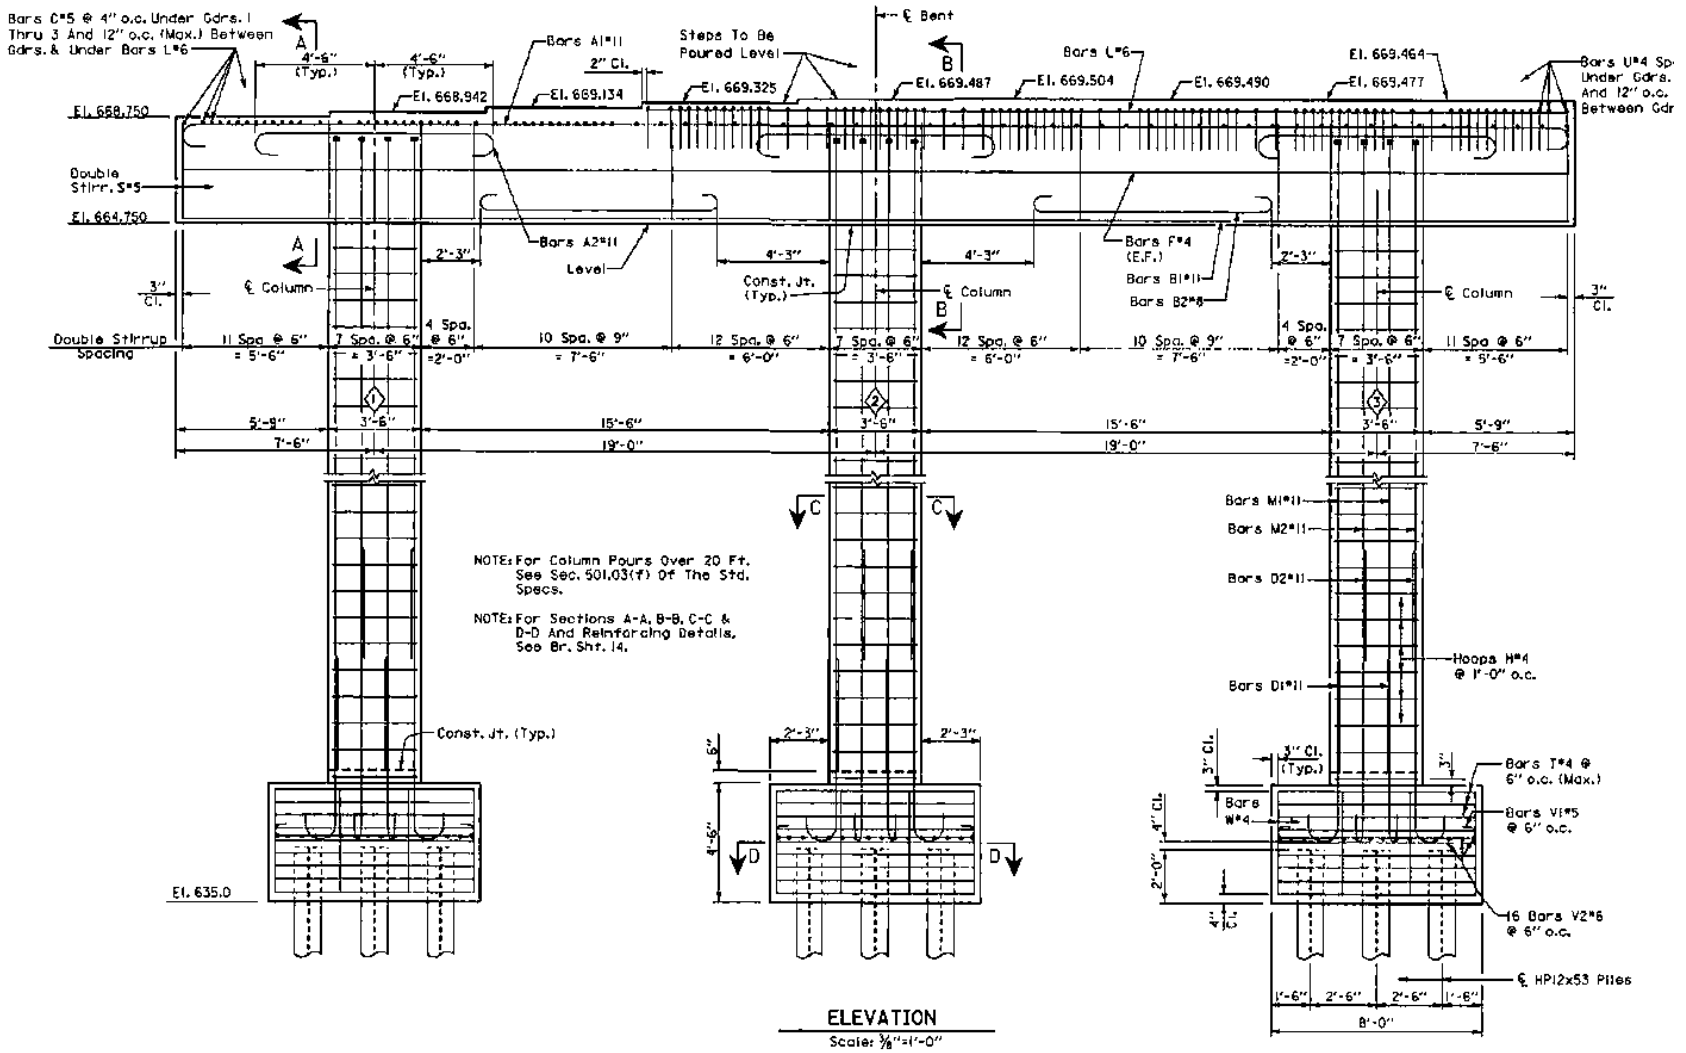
Etowah County Bent 2 elevation view (ALDOT 2011)
